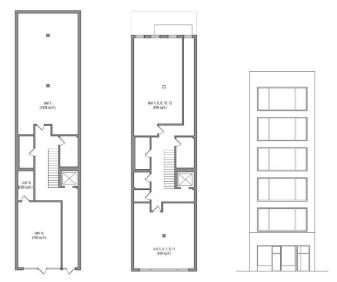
, 404, 405 (left to right): Building 14 first (ground) floor (1911); floors 2–6 (1911); street-front elevation (1980). For plans, north is down.
